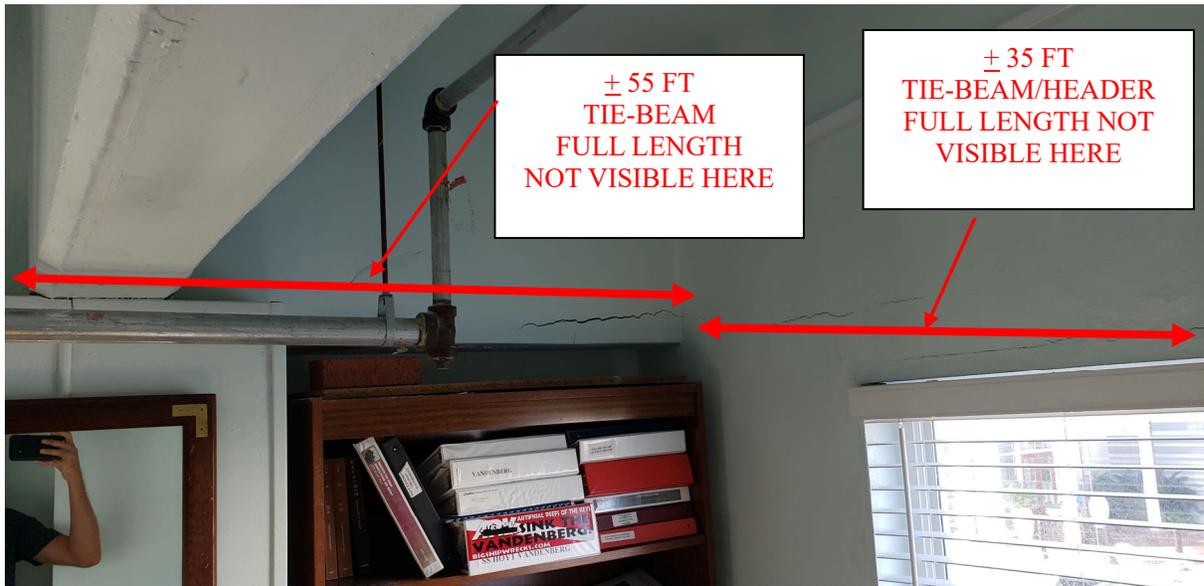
A. Interior corner view. Location 34: Approximately 55 ft long new 12x24 horizontal tie-beam. See detail 3/S103. Approximately 35 ft long new 8x24 horizontal tie-beam/header. See detail 10/S106.
